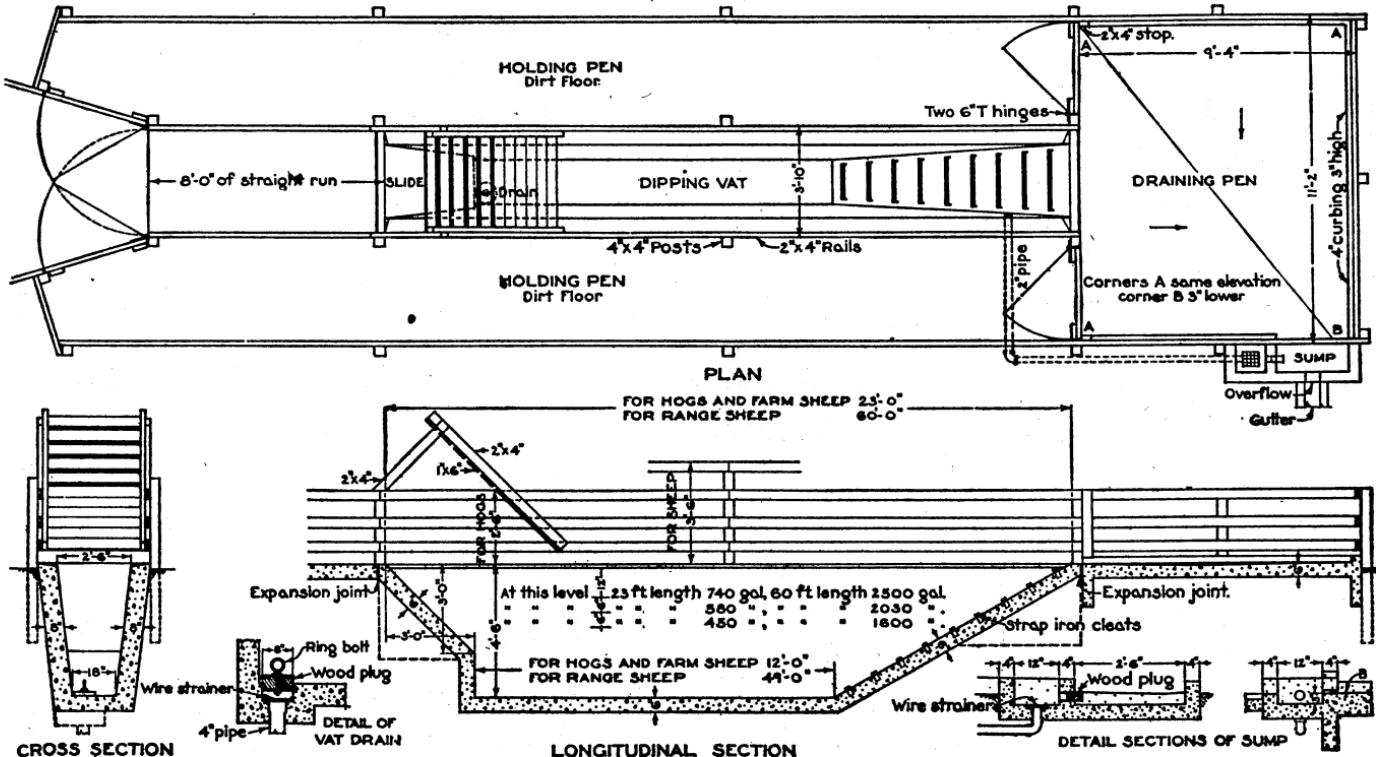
Detailed construction of dipping vat shown in Figure 17. (Design No. 1758)
